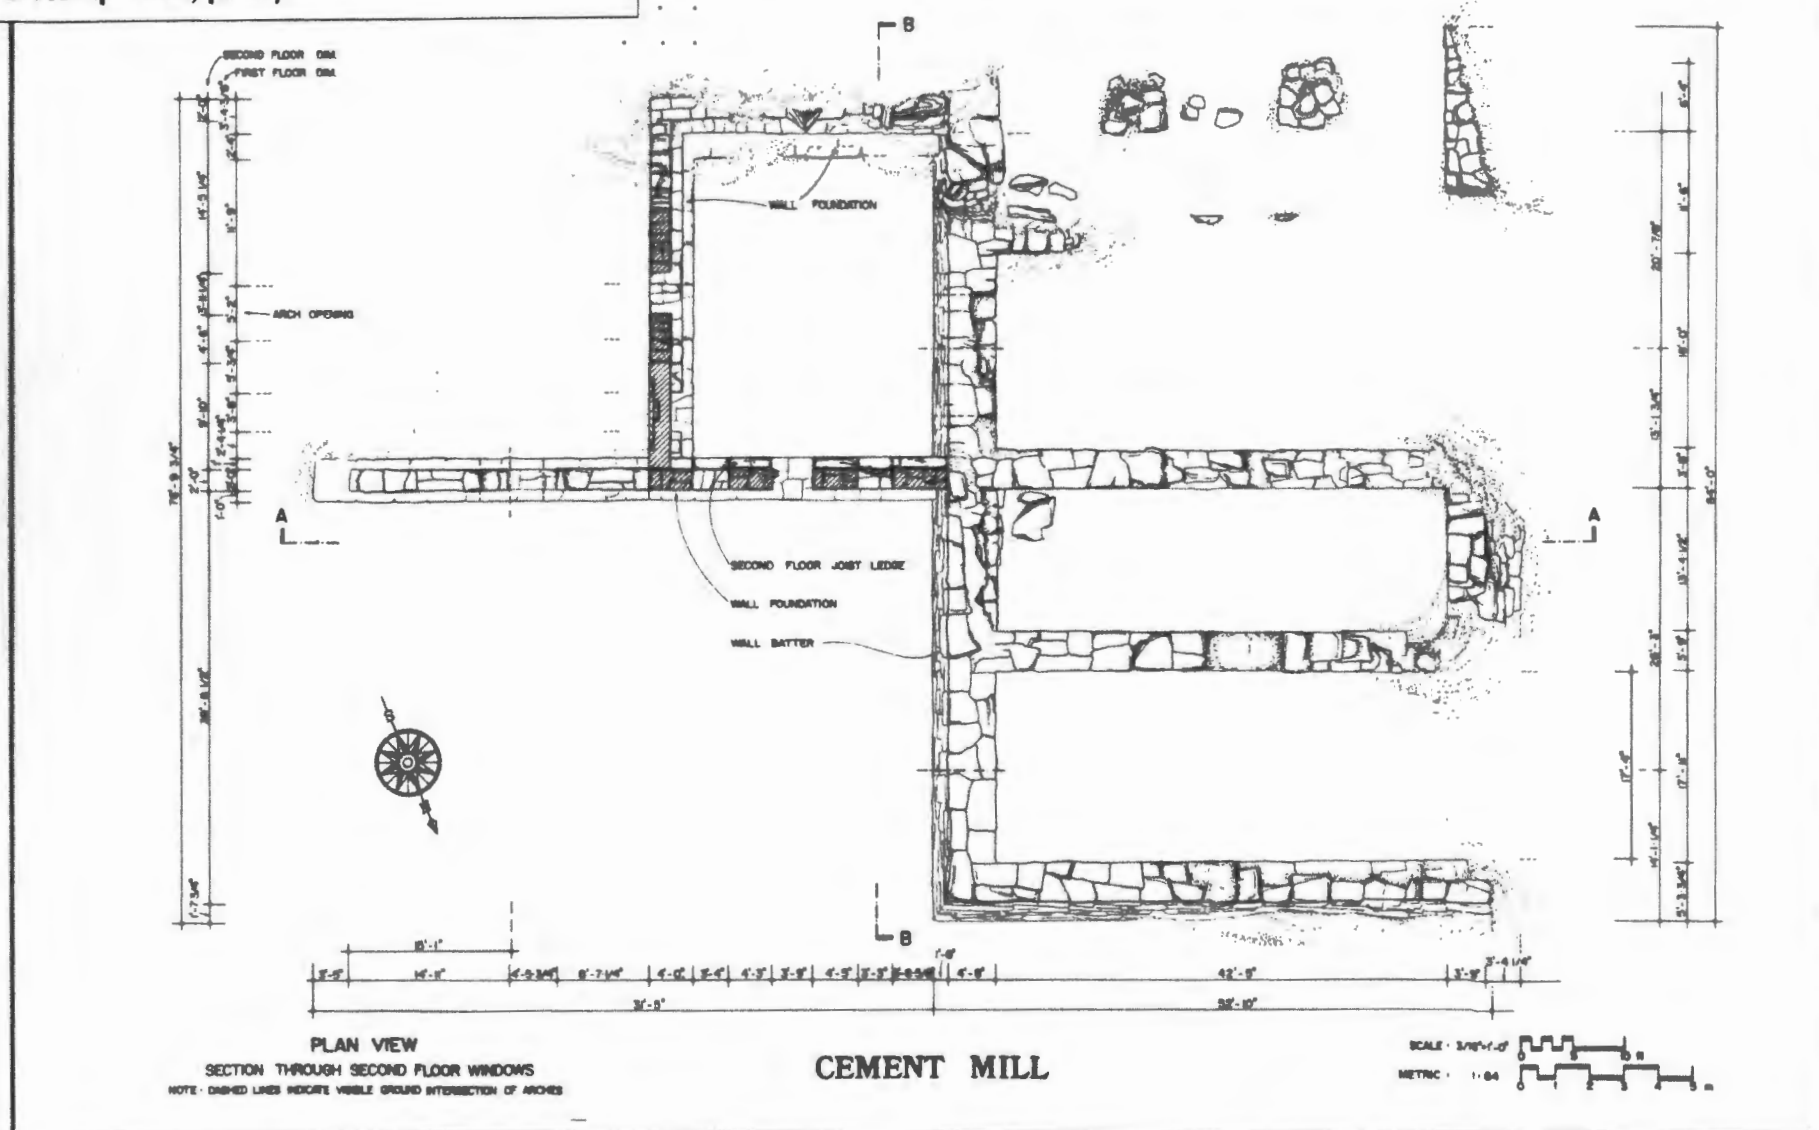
This drawing shows the plan of the Shepherdstown Cement Mill at the level of the second floor works. The plan also shows when the sections were taken for the vertical section drawings. Apart from details of the walls of the various parts of the mill the drawing is intended to provide an orientation for the photographer of the mill. (IHTIA)
